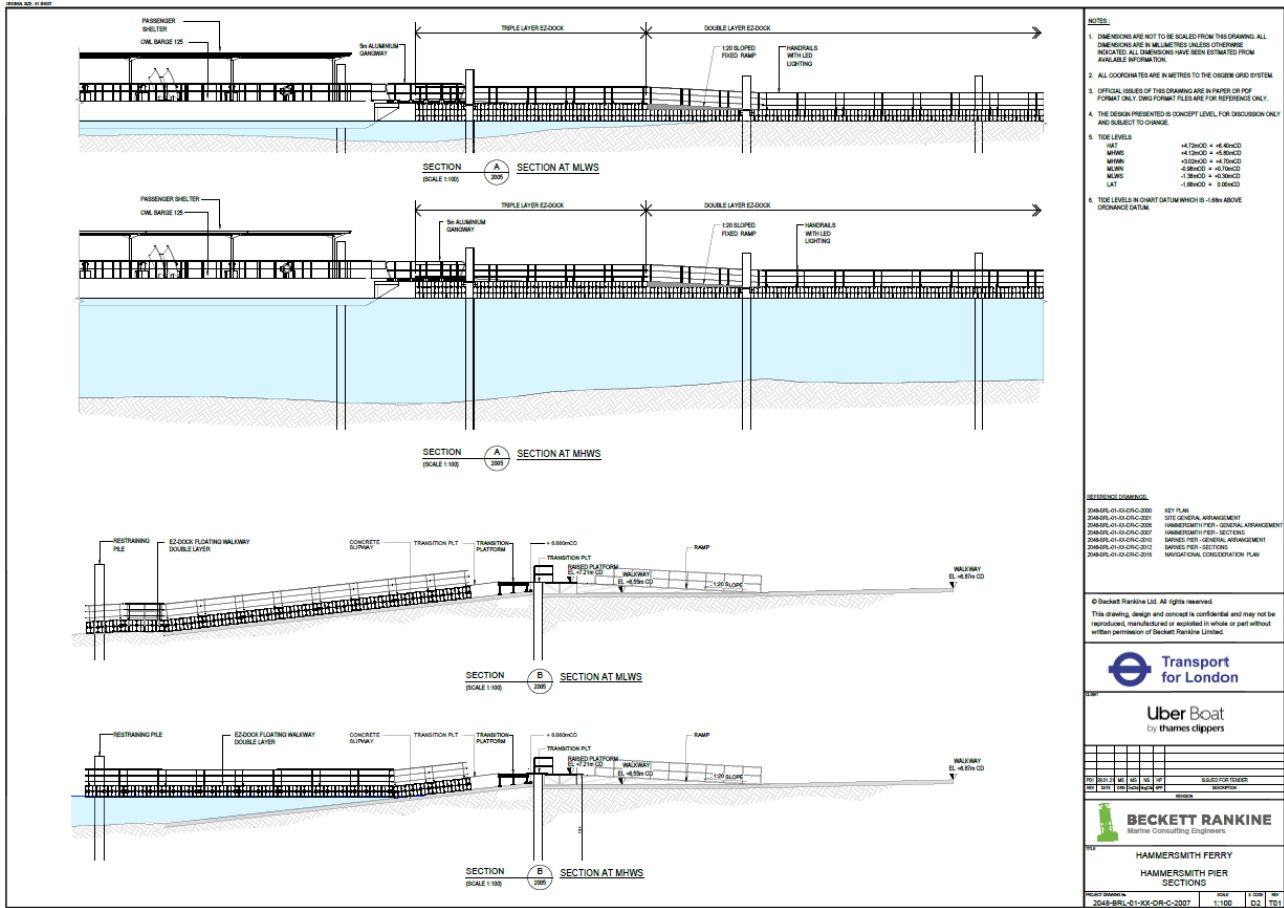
Cross-sections of the floating walkway proposed to access Hammersmith Temporary Pier
